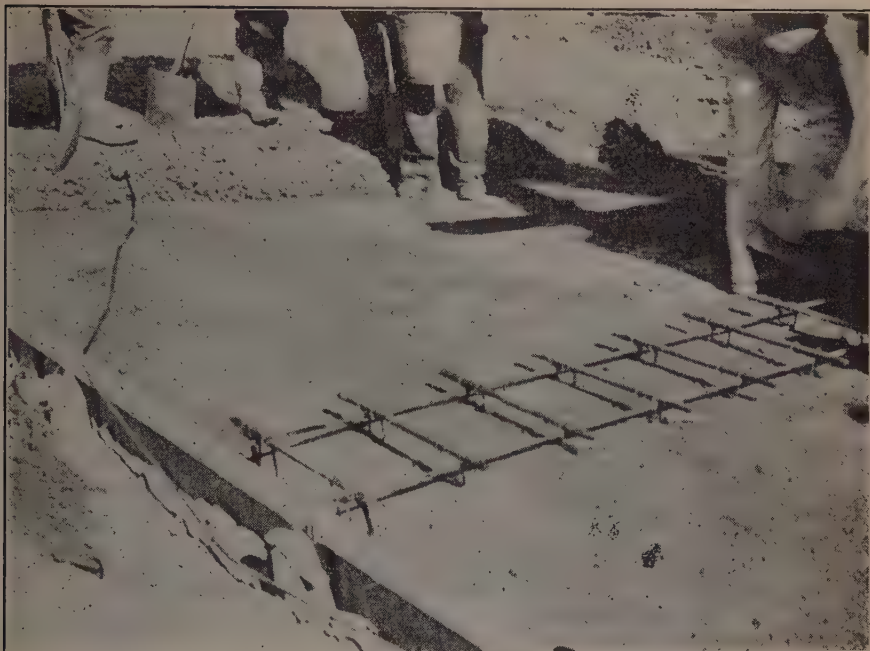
U-SHAPED CHAIRS RESTING ON THE SUB-GRADE AND WELDED TO THE SPACER BARS (TEST No. 12).
